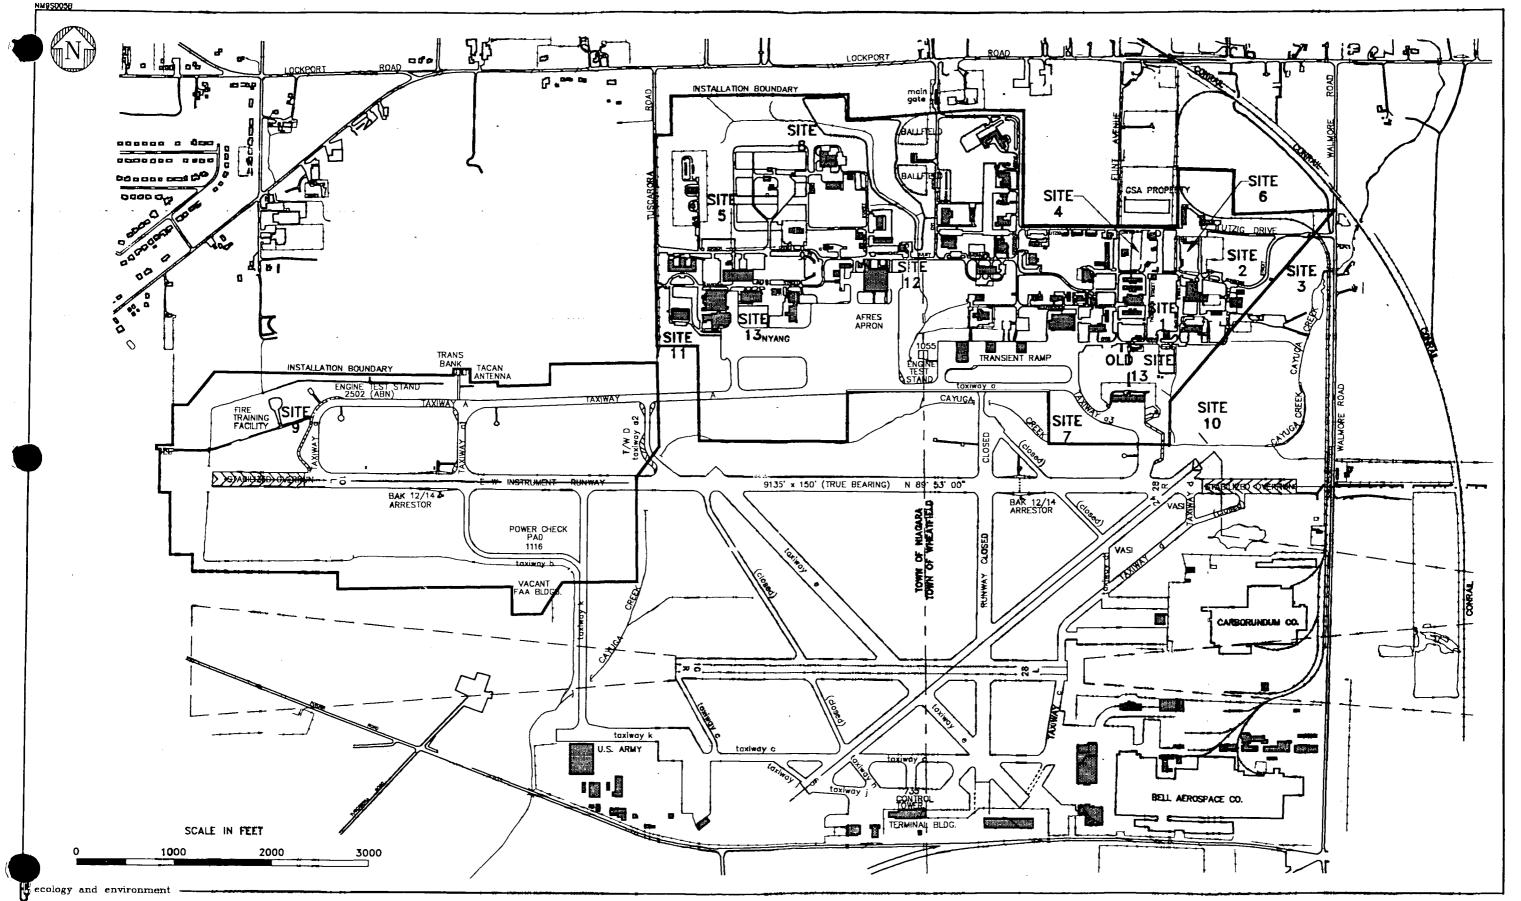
INSTALLATION PLAN NIAGARA FALLS IAP-ARS
